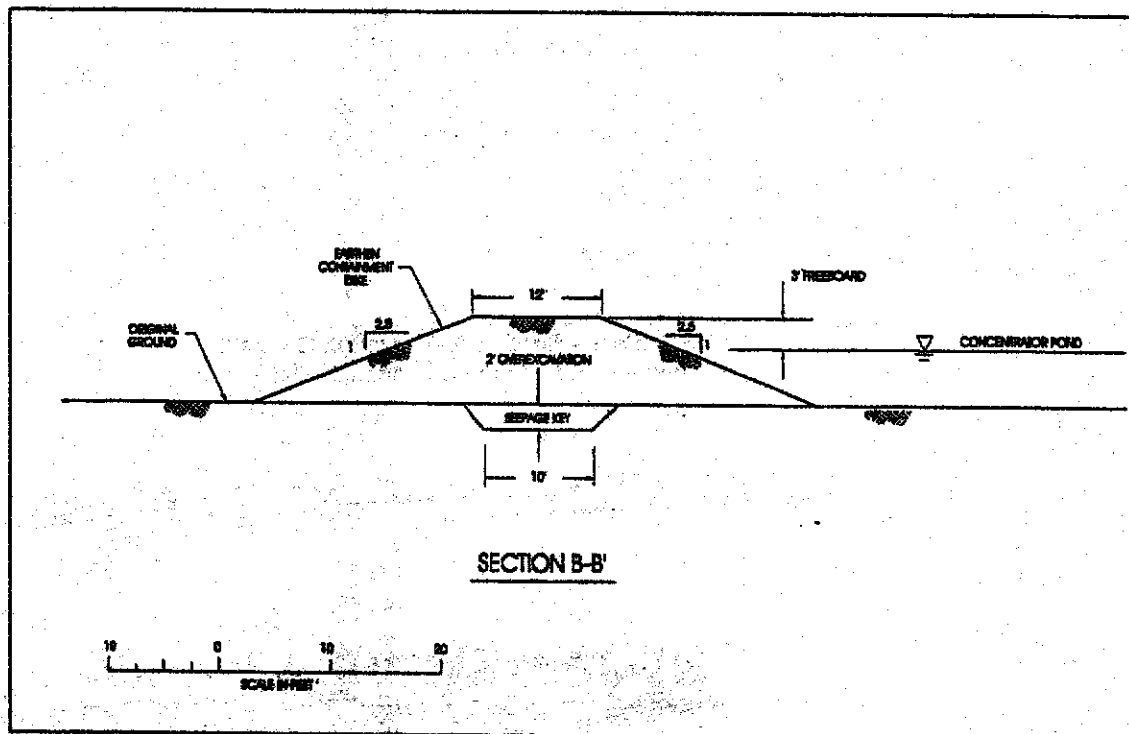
Typical Containment Berm Section Concentrator Ponds
